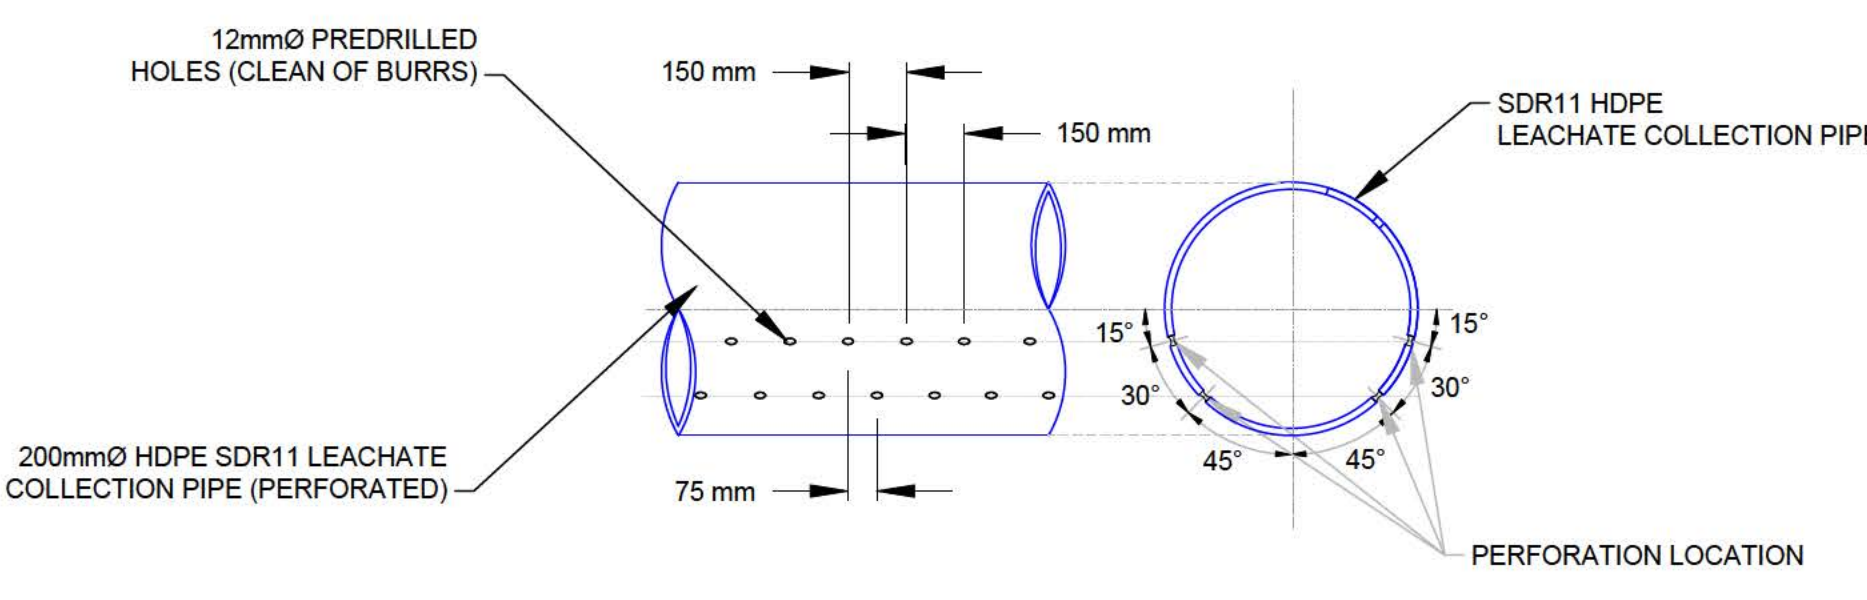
LEACHATE COLLECTION SYSTEM PIPE AND SWALE (TYPICAL)
